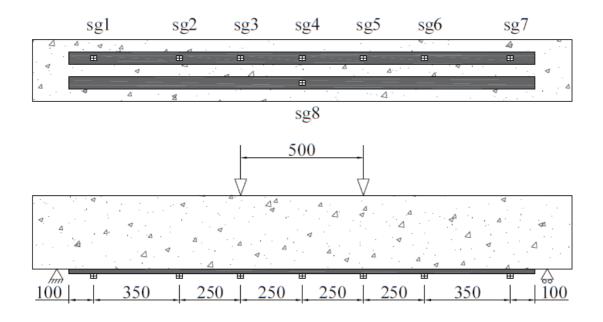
Location of strain gauges beam B5-6 (All dimensions are given in millimeters)
